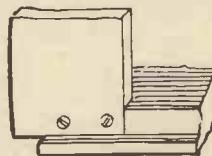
The bottom rail should be notched in and screwed as shown here.
